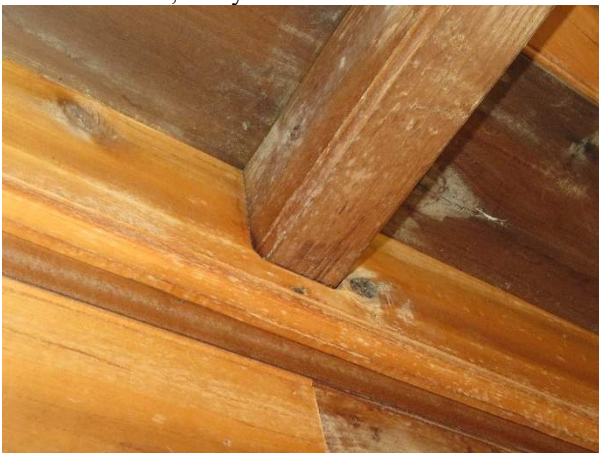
Ceiling moulding and bearing end of the exposed ceiling beam at the east wall.
